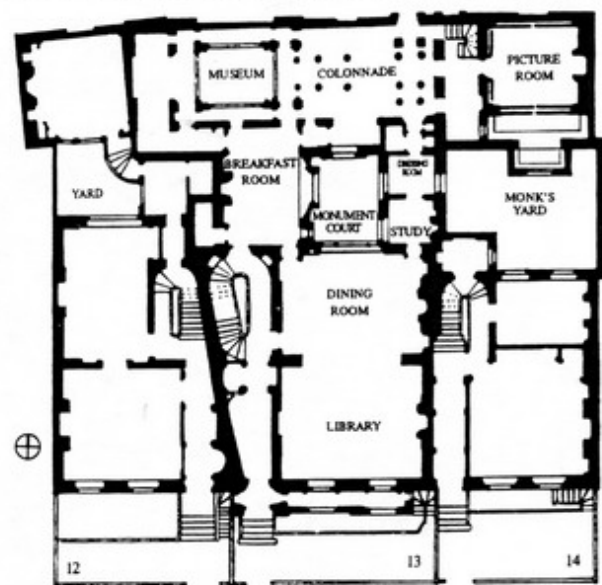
12-14 Lincoln's Inn Fields. Ground-floor plan as existing about 1825 (author, based on Museum documents and guidebook plans).
